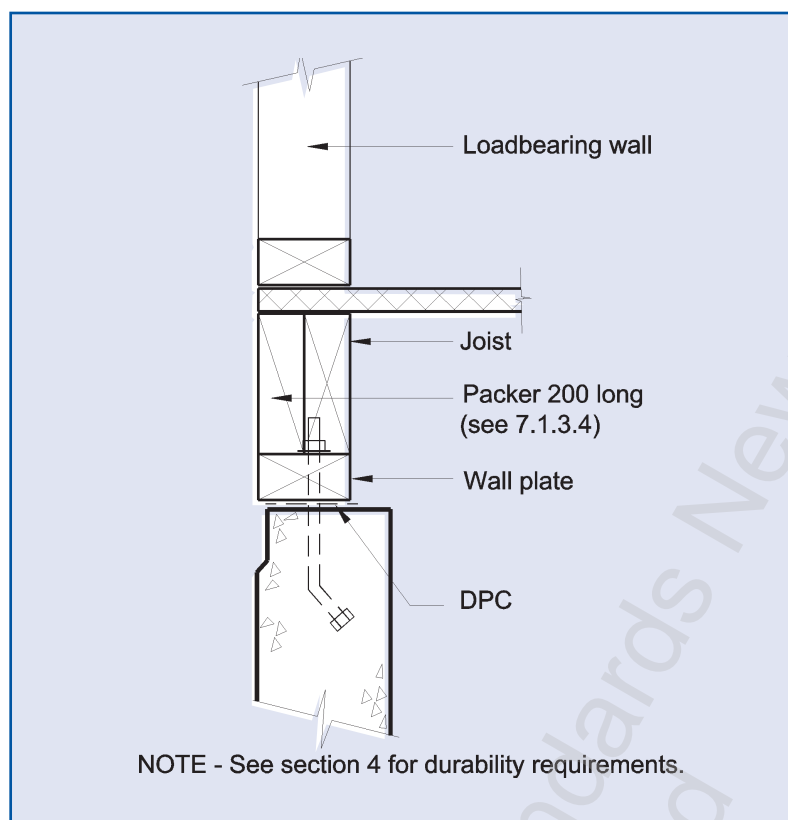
Support to floor joists under loadbearing walls (see 7.1.3)
